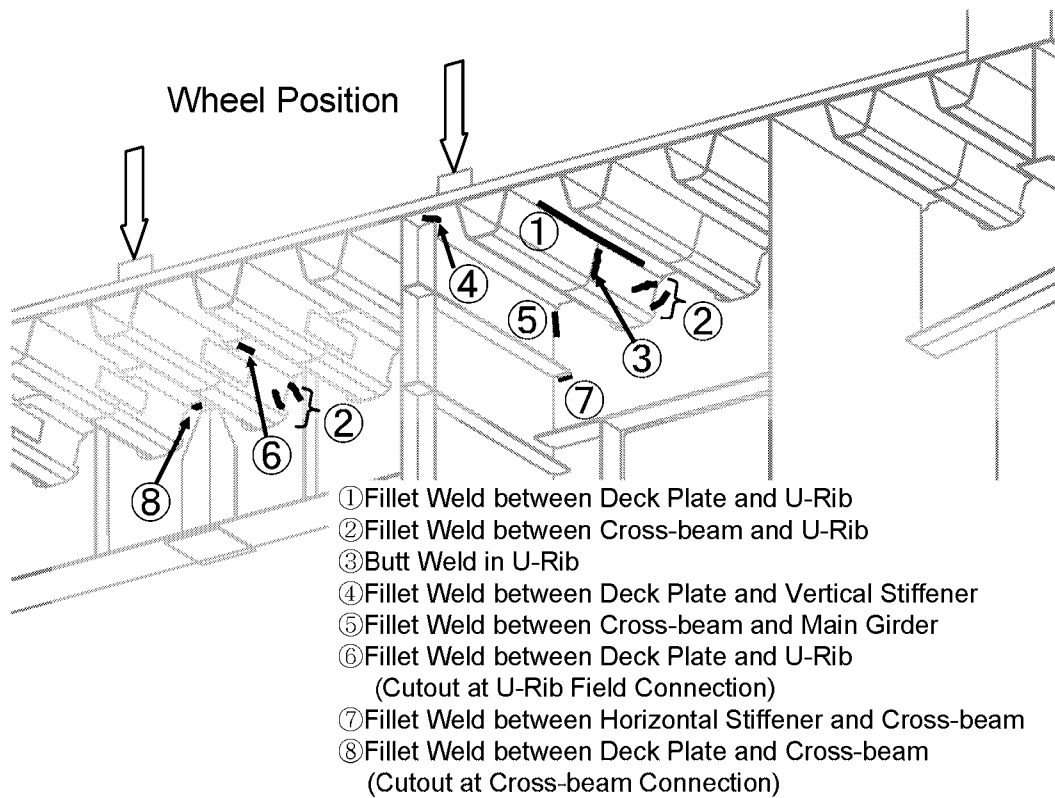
Fatigue Damages of Orthotropic Deck Bridge
